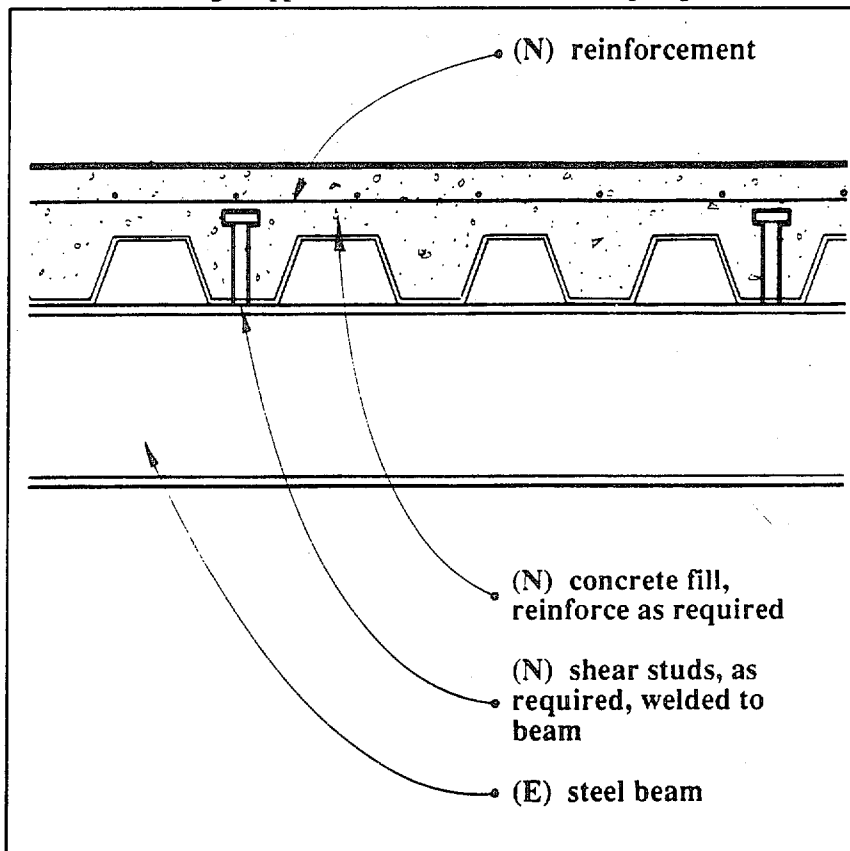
Strengthening an existing steel deck diaphragm.
